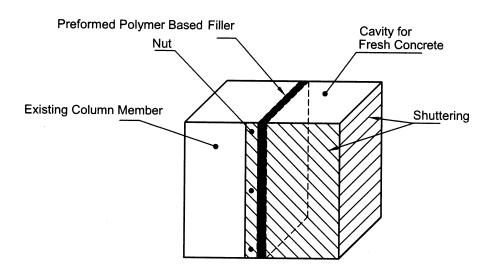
TYPICAL LAYOUT OF USE OF PREFORMED POLYMER BASED FILLER AS SHUTTERING TO COLUMN MEMBER
